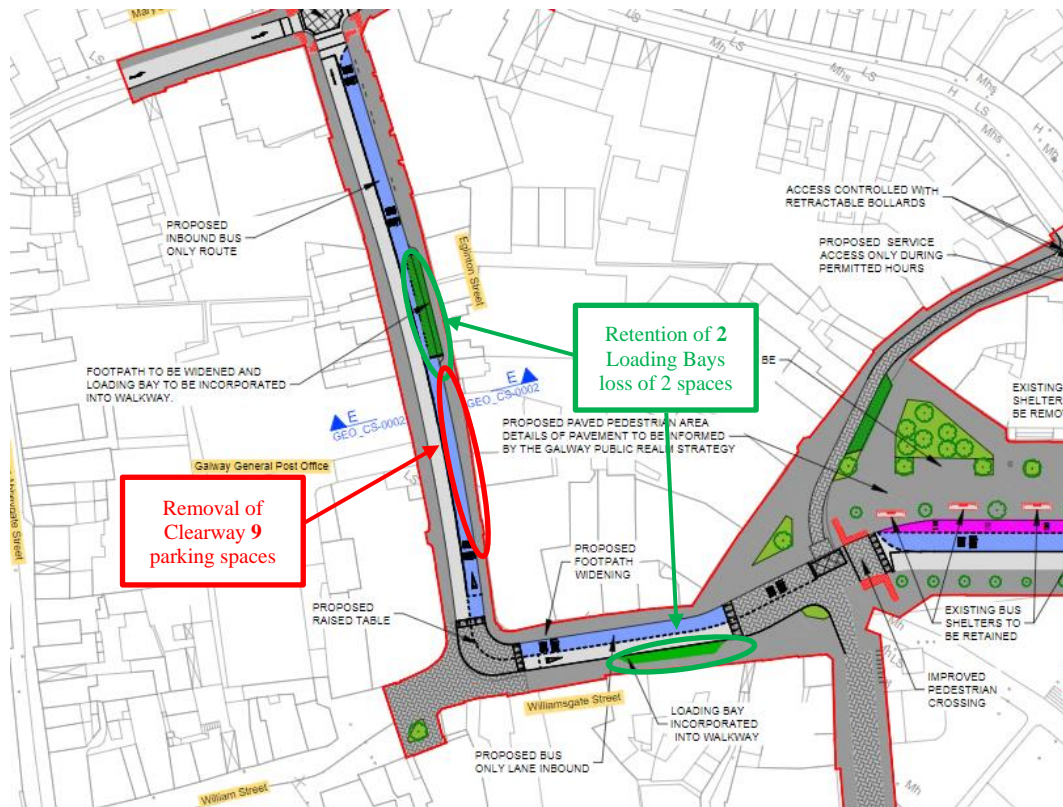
Proposed scheme design on Eglinton Street and Williamsgate Street
